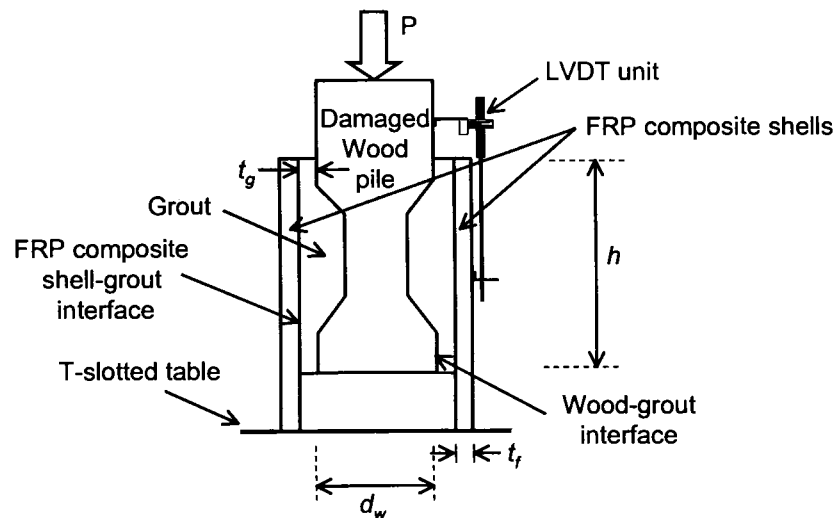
Schematic of Test Set-Up for Repair System B
